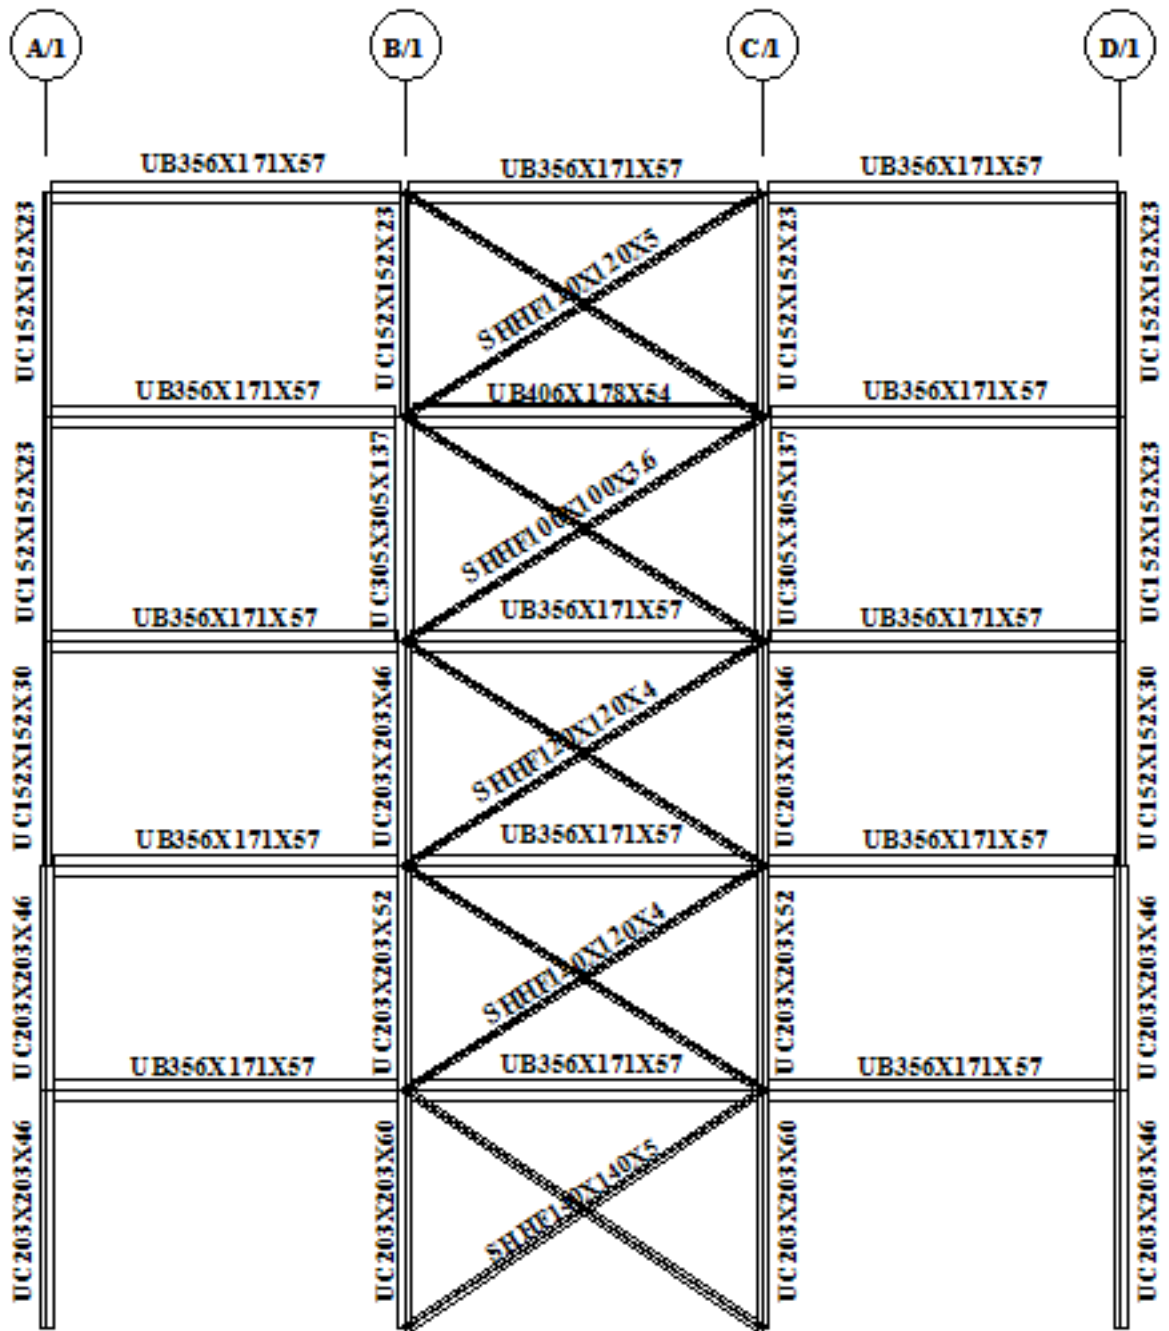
(a): Design result of symmetrical plan and section with RHS brace steel profile, section 1_1.
